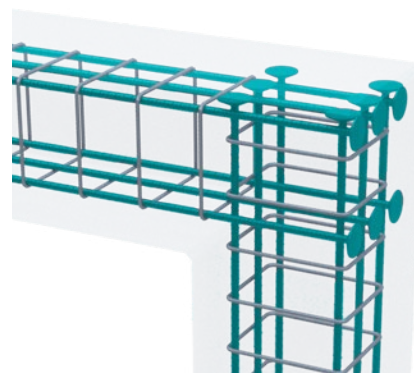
FRAME CORNER WITH REINFORCEMENT ANCHORED BY PSB® HEADED ANCHORS
